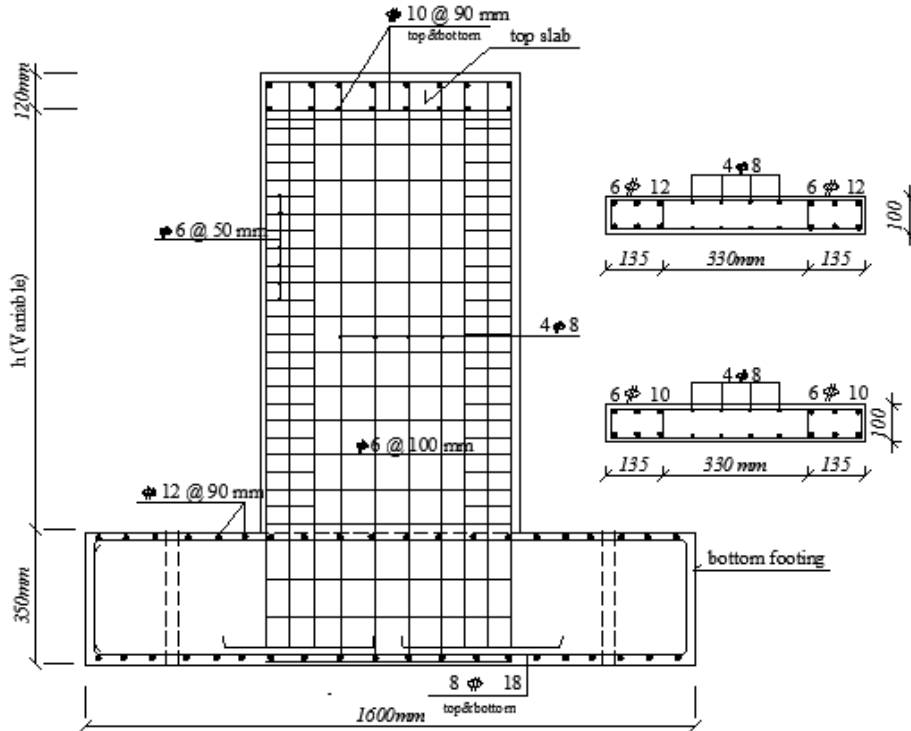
Concrete Dimensions and Reinforcement Details for Group (3) and Group (4)
